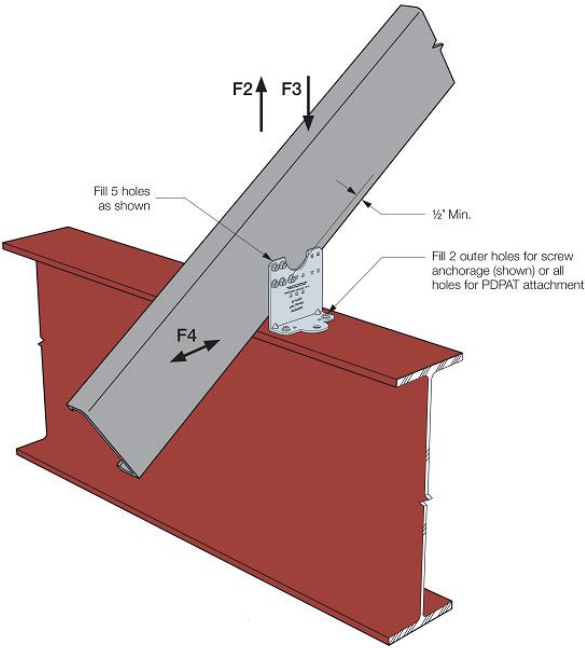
E—SCC SERIES CONNECTOR RAFTER CONNECTION APPLICATION INSTALLATION DETAILS
